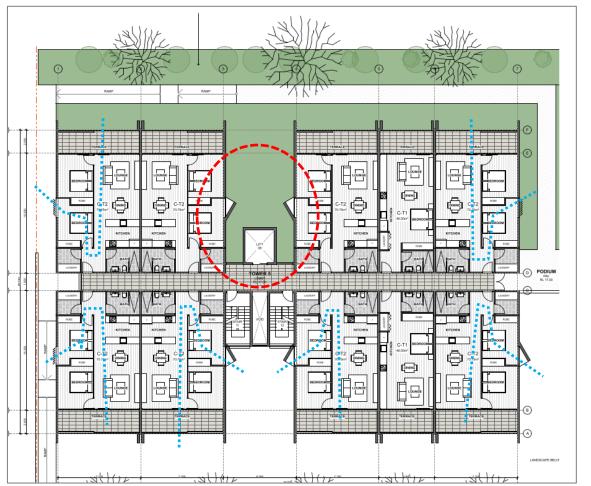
Inappropriate areas of Communal Open space to Towers 5 and 6, and instances of 'corner units' not achieving natural cross ventilation, given small windows size, path of travel and as windows face in same general direction
